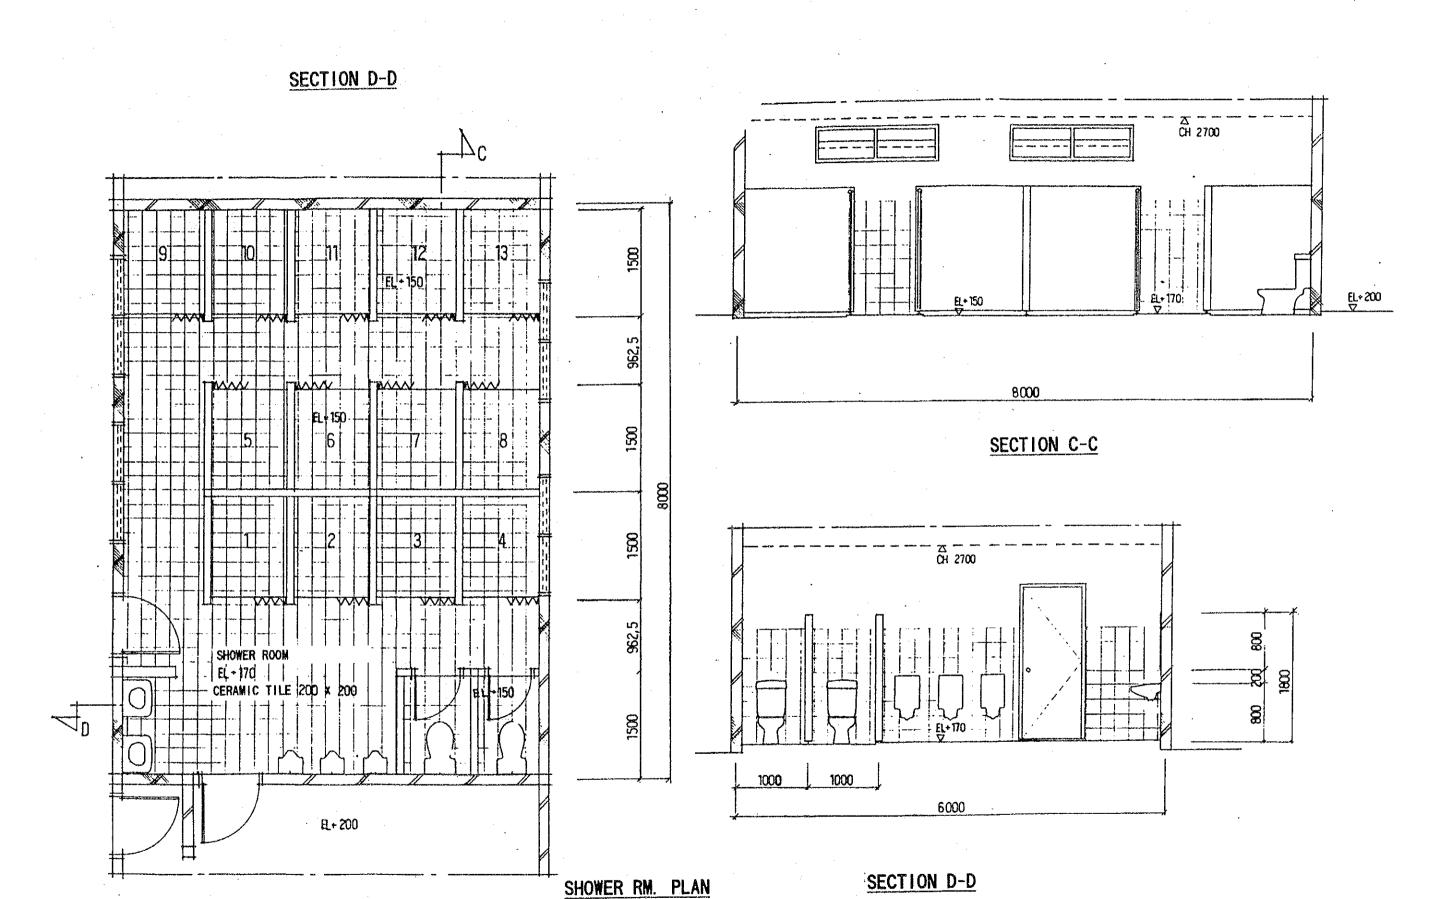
(2) Plan of Survival Training Facility(Building Portion)
